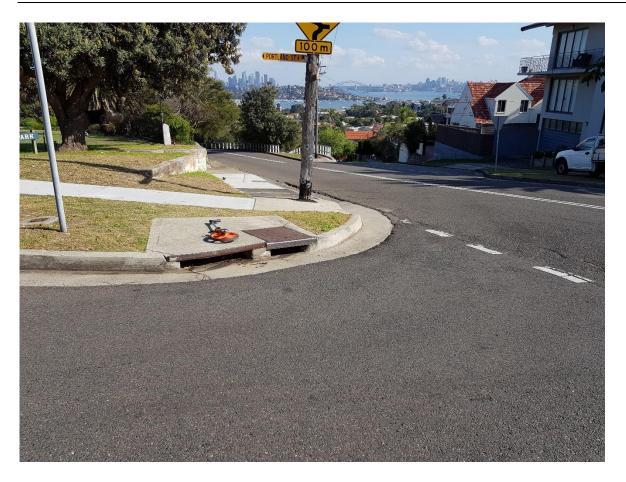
Existing sightline to the left (west) for northbound traffic in Portland Street at Blake Street.
